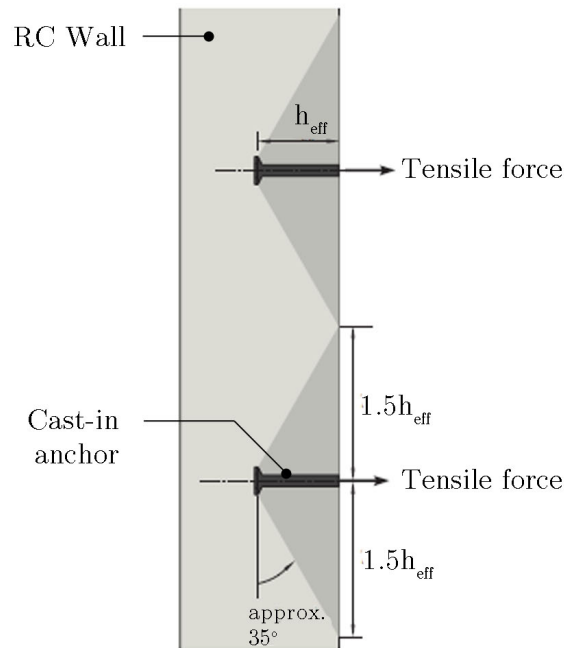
Cone Failure for Cast-in Anchor in Direct Tension (reworked from Ancon Building Products (2014))
